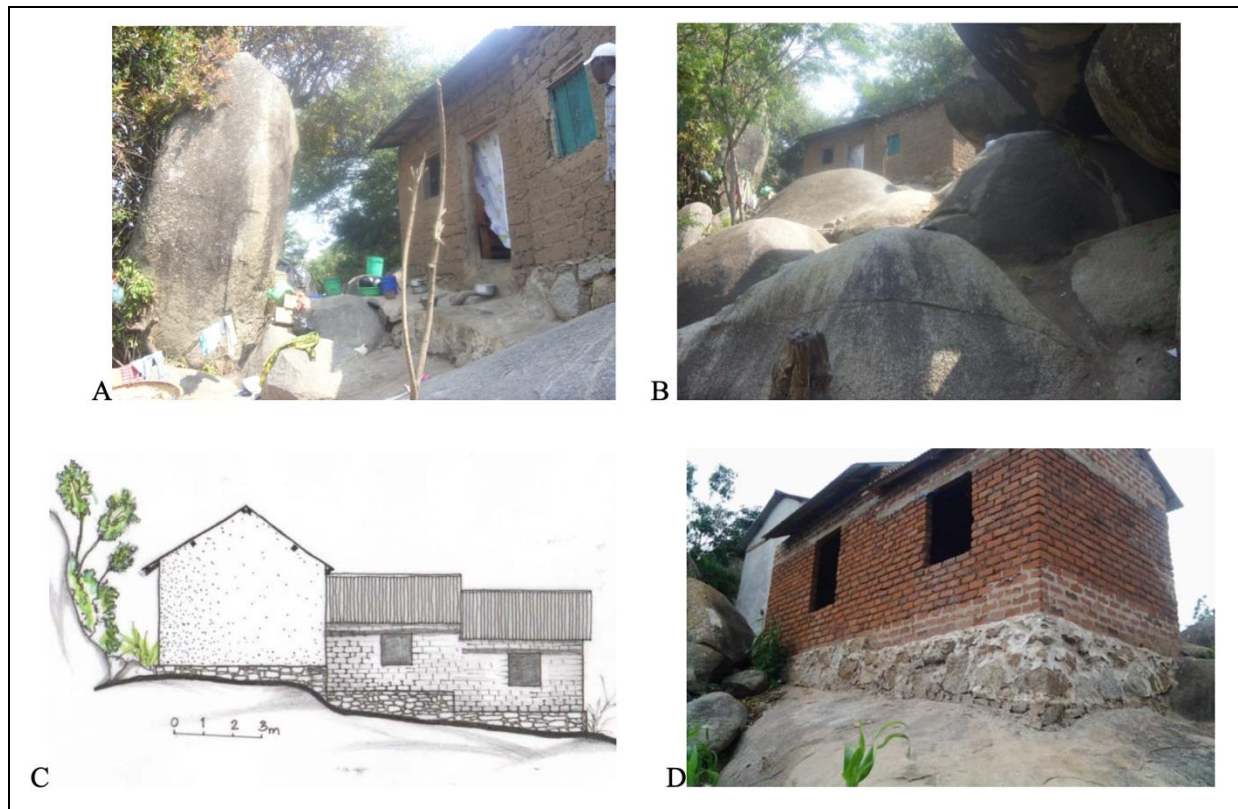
A, B, C., and D: Some elements that generate the house form; these components include walling, openings, foundation, and roofing. Author's fieldwork study 2025
